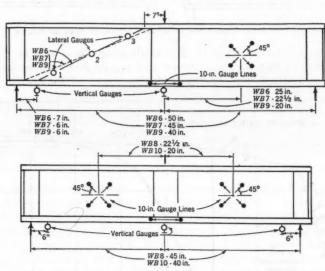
MAKE-UP AND LOADING ARRANGEMENT FOR MAJOR INVESTIGATION, GROUP B BEAMS
